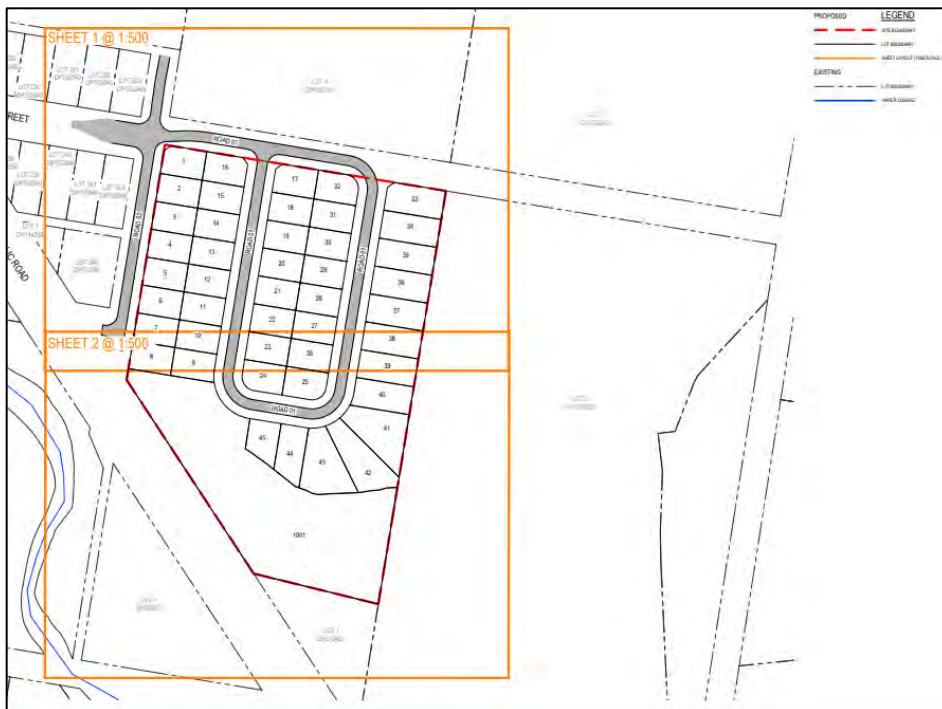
An overview of the proposed subdivision layout by the Applicant.
